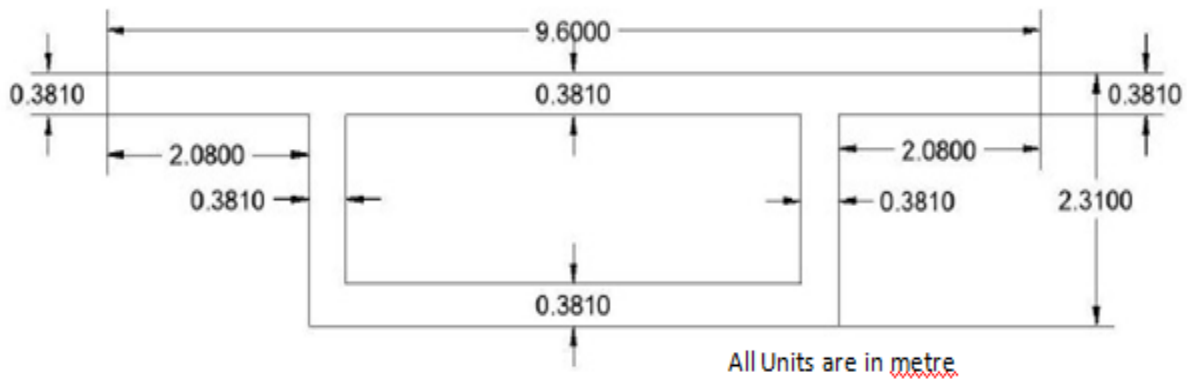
Cross Section of Simply Supported Box Girder Bridge considered for study
